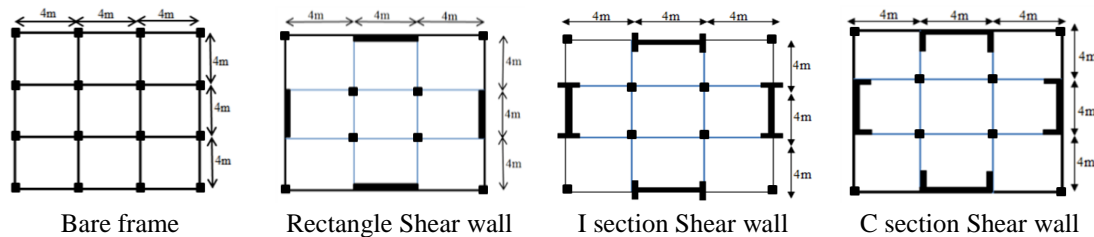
Plan of bare frame and frame with various shape of shear wall.
